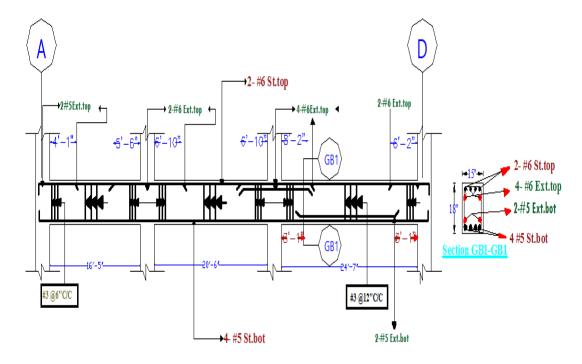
Reinforcement area of Grade Beam X-Axis (in Inch Sq.)
